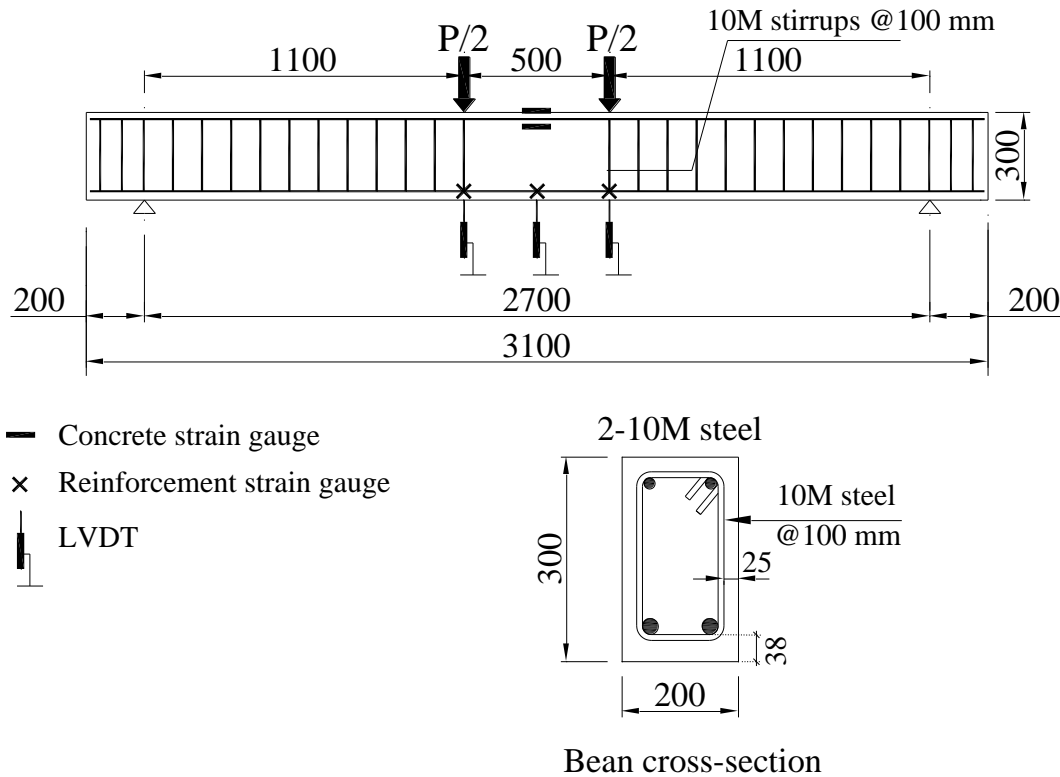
Details of beam specimens: geometry, reinforcement details, and instrumentation
